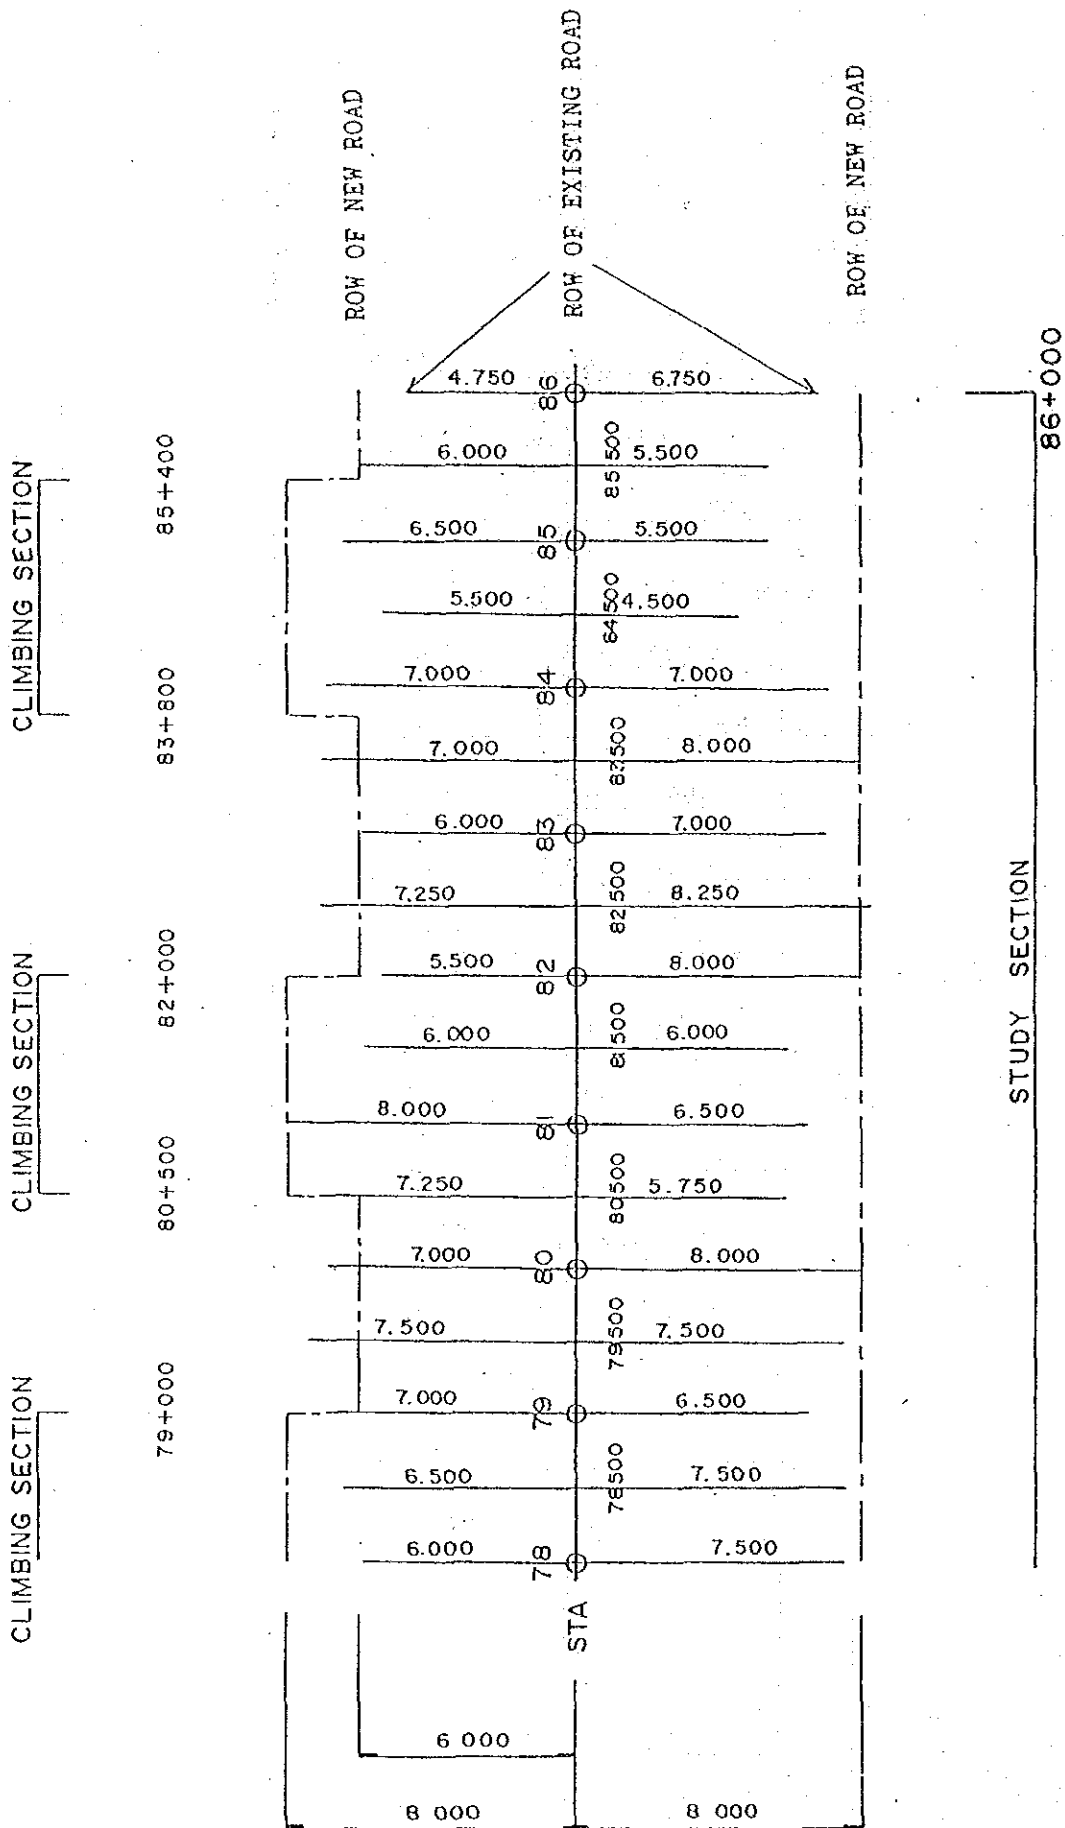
B Standard Section and Climbing Section (B)
